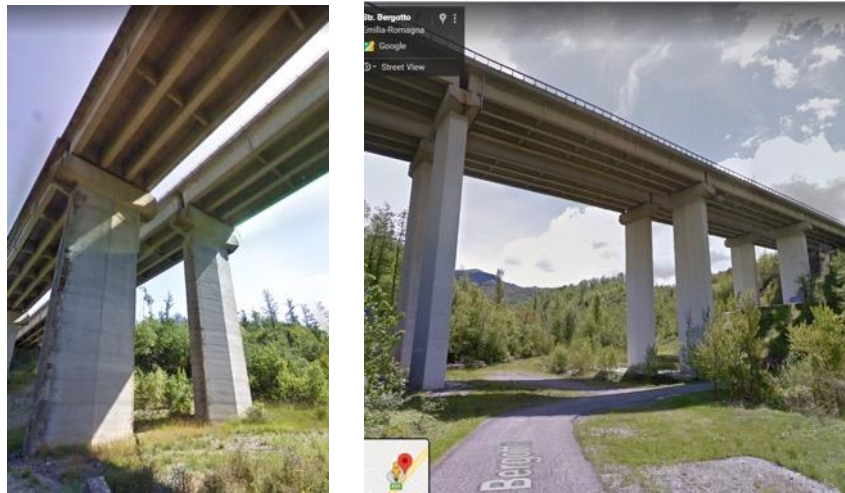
Some pictures of the bridges on the E31 route (A15 – Cisa motorway), near Roccaprebalza: bridge “Rio Dei Cani” (left) and bridge “Rio Pizzarotta” (right).
